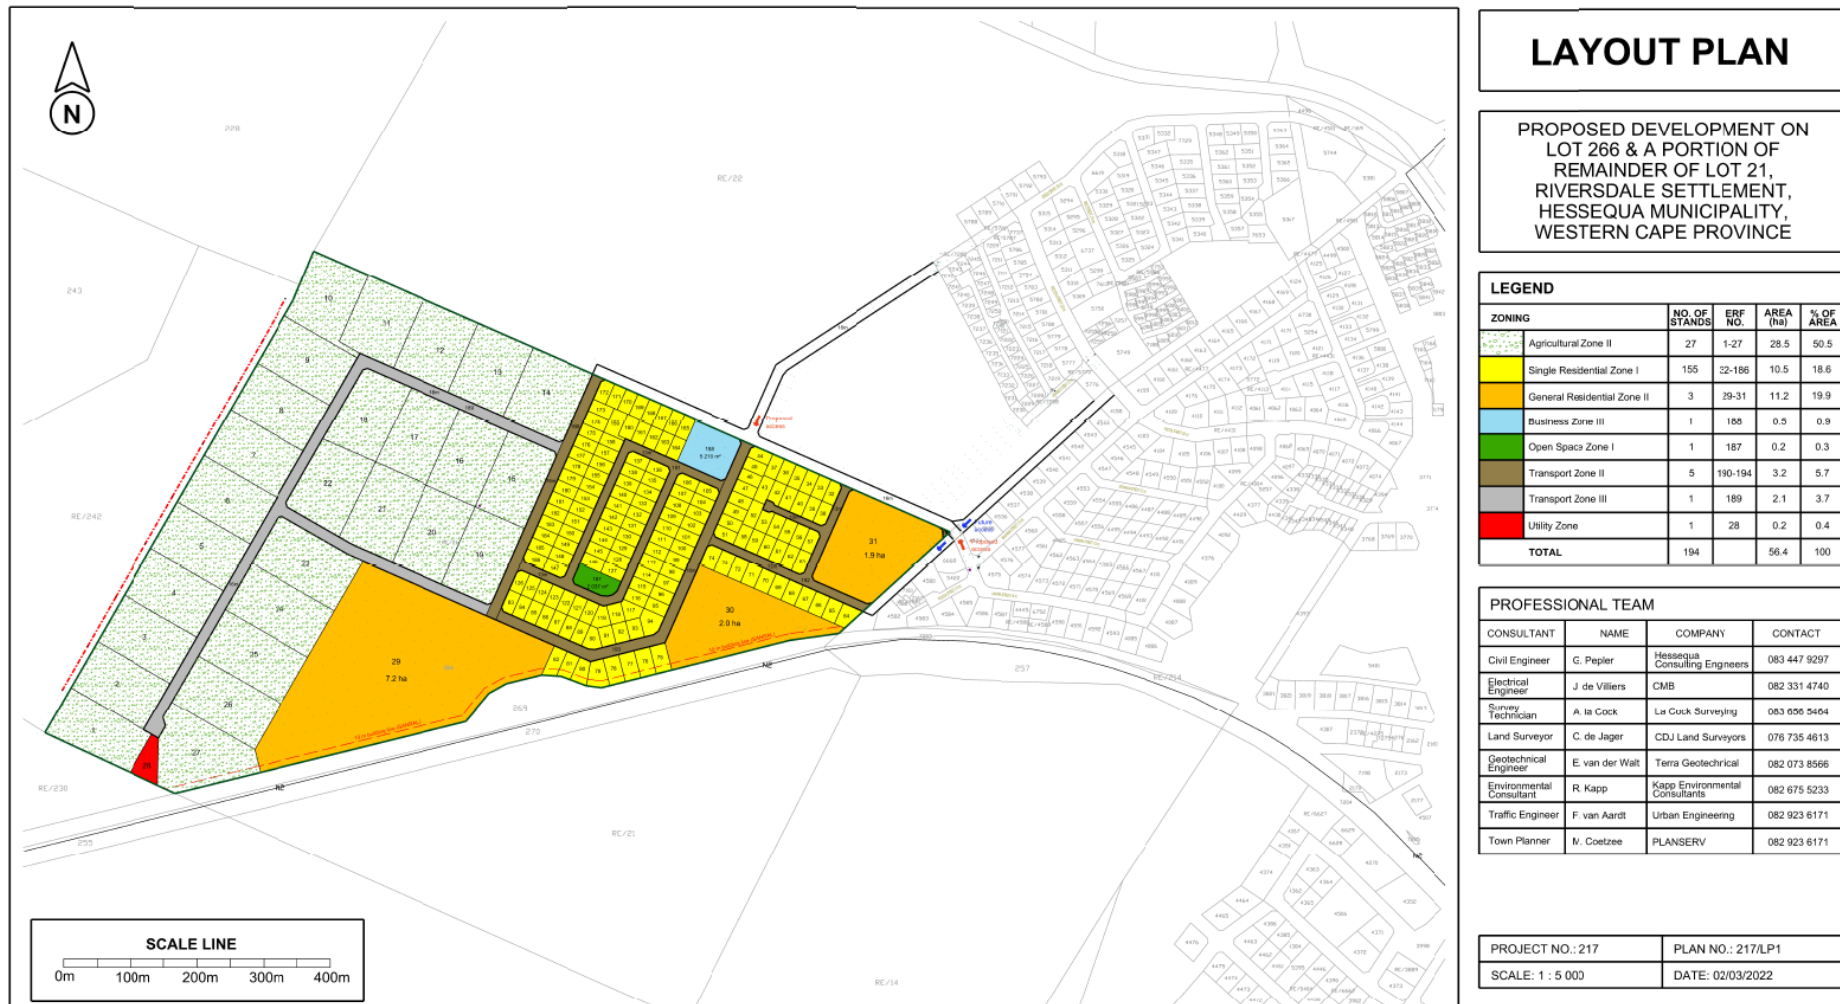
Spatial Development Plan (SDP) – Erf 266 & Portion of Remainder of Erf 21, Riversdale. Courtesy: PLANSERV (Pty) Ltd – Plan No. 217/LP1
